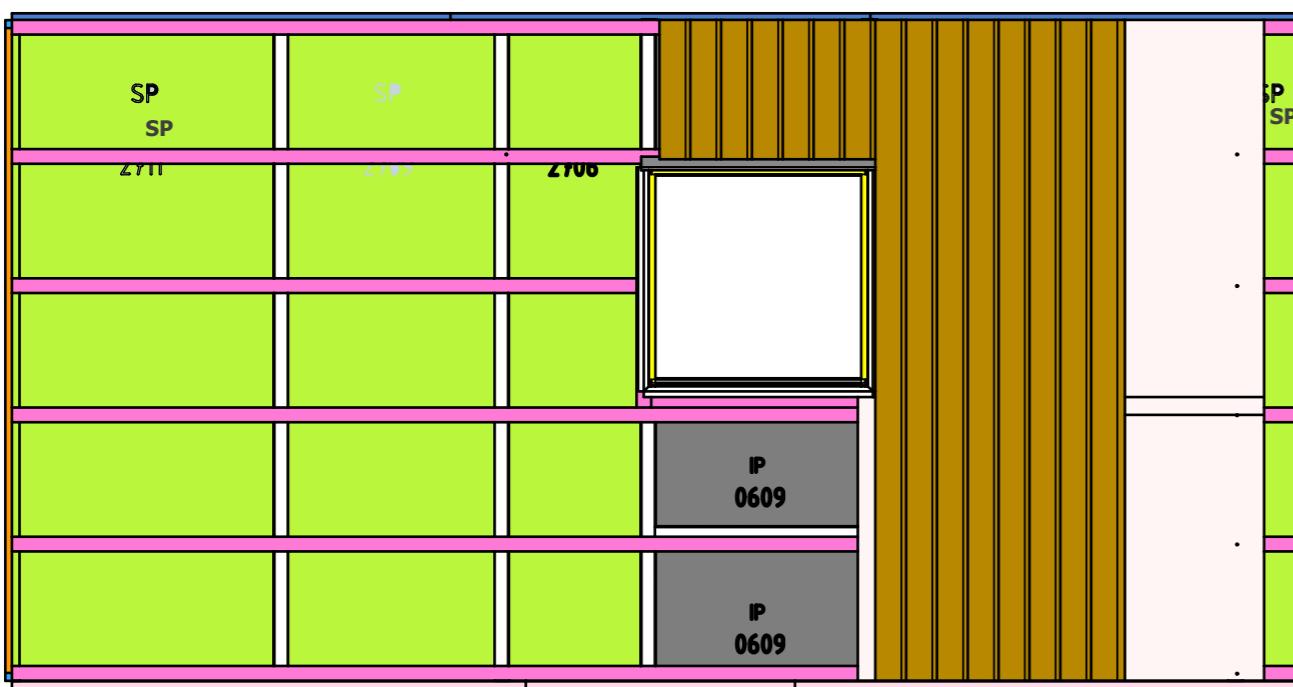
Nail depth with Cladding to Panelok Standard Panel
